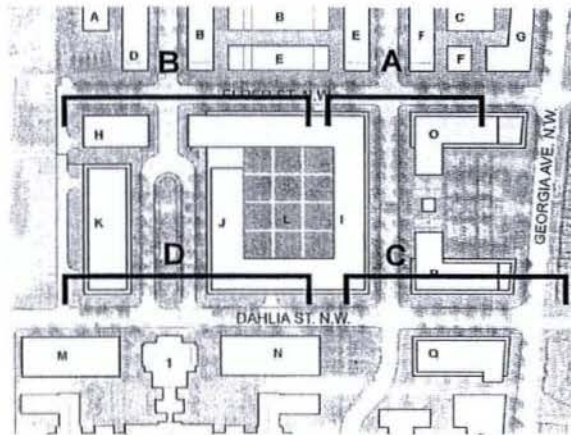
Site Sections Key Plan - Town Center. Source: Perkins+Will
